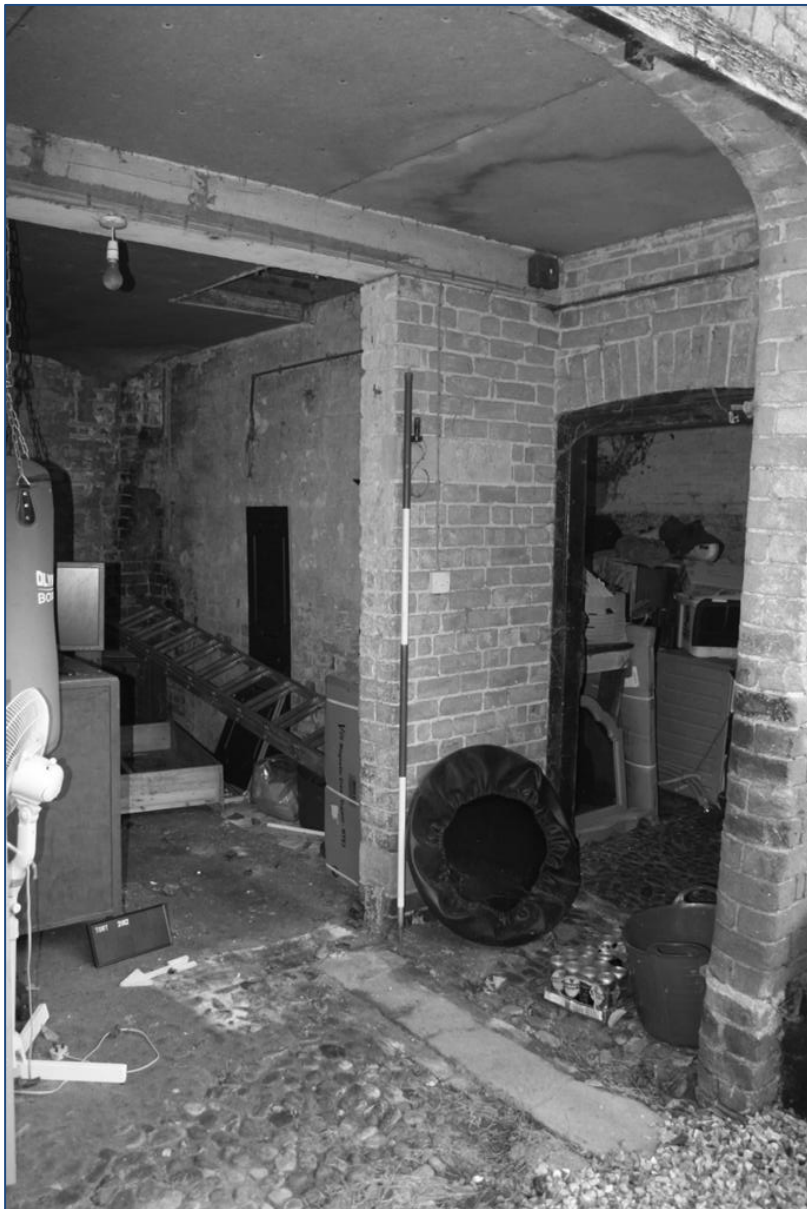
Coachhouse porch leading to Stable Area 2 looking south-east.
